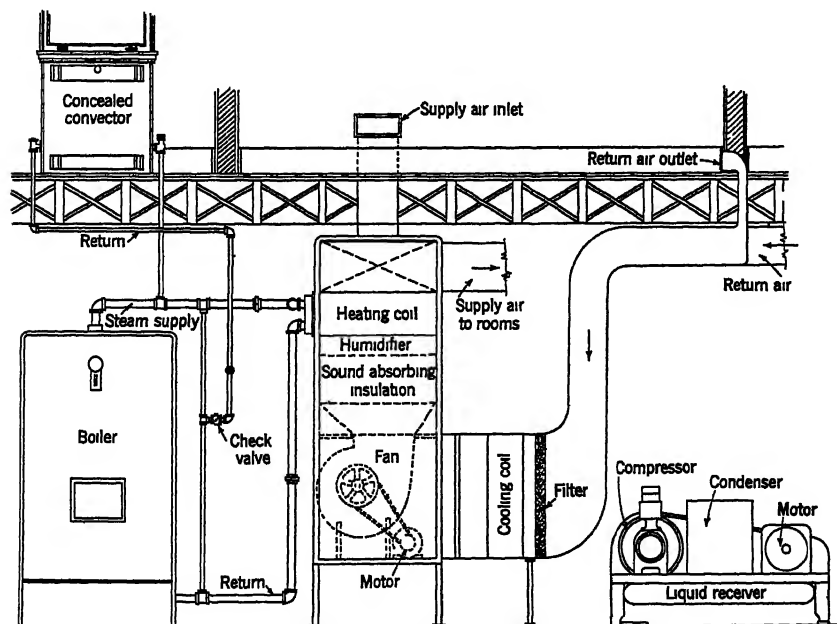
RESIDENTIAL CONDITIONING UNIT WITH STEAM BOILER
